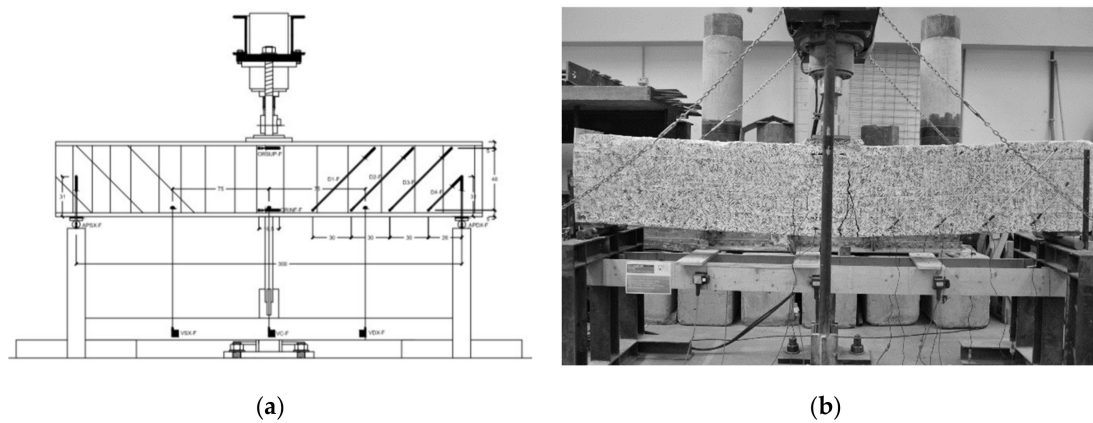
(a) Test set-up of the BEAM specimen; (b) failure mechanism in bending.
